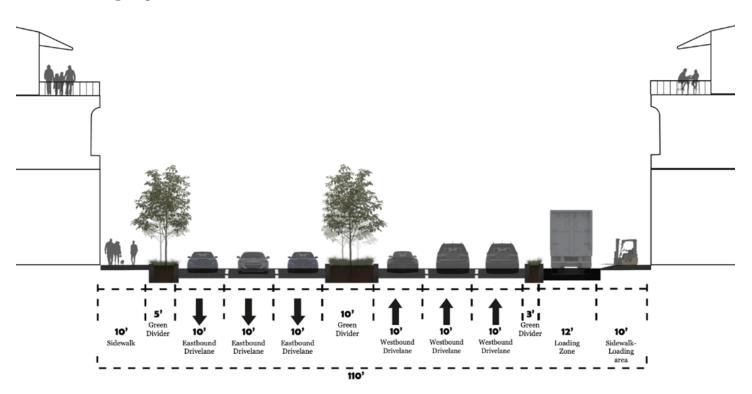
1st Street Section at Wren Avenue illustrating the auto-oriented streetscape.
